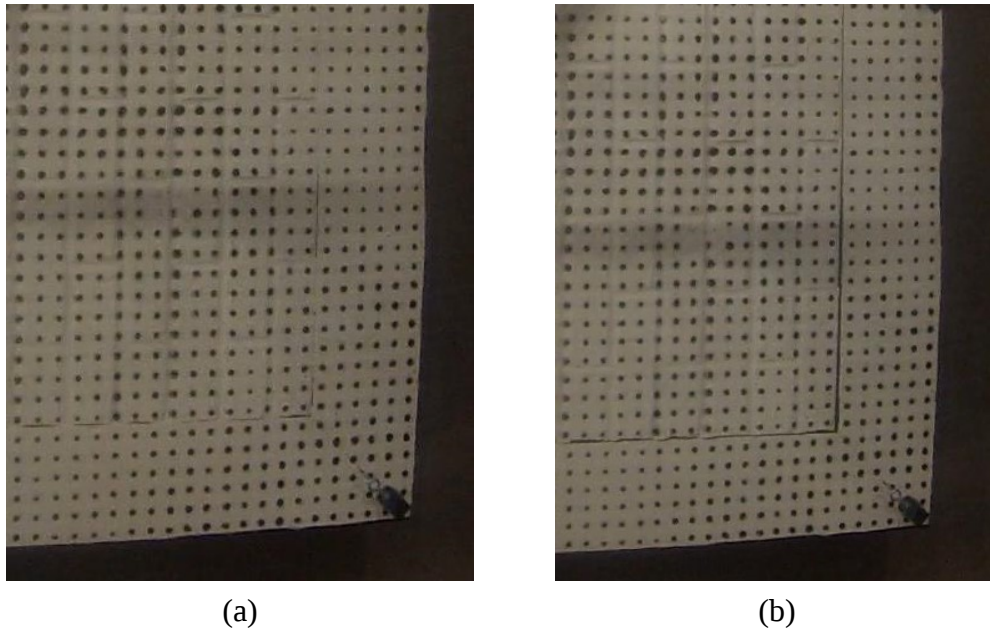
Separation of concrete and masonry components (a) before loading and (b) after loading
